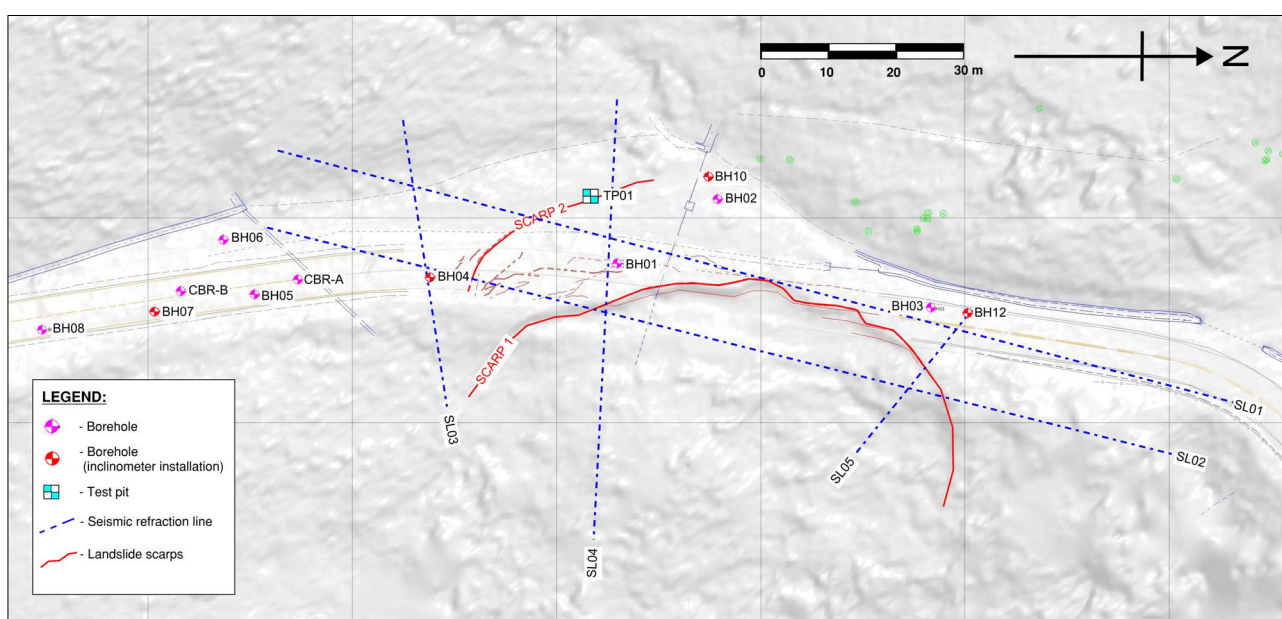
Geotechnical investigation site plan at the Garie Road landslide site. Source of DTM (MES, 2022).
